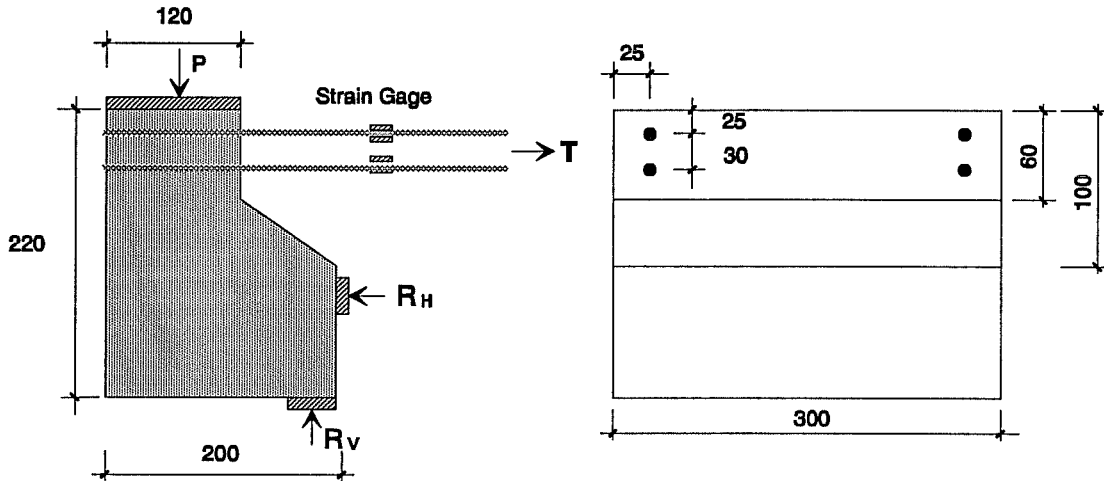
Specimen of Beam End Support (Ref. 6)
